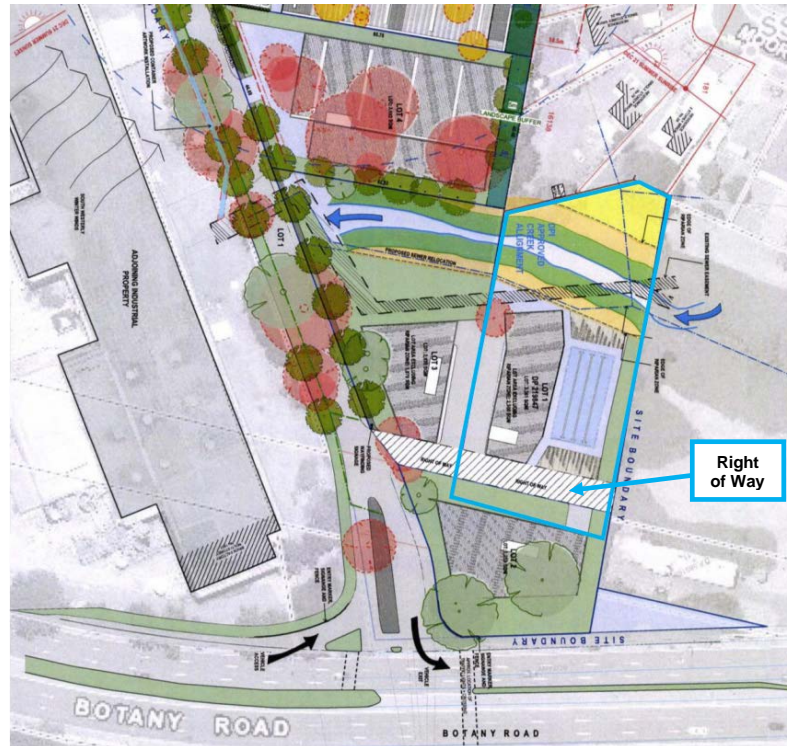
Location plan – site shown red, adjacent Council-owned site shown blue (Source: Council Gateway Review Submission)
